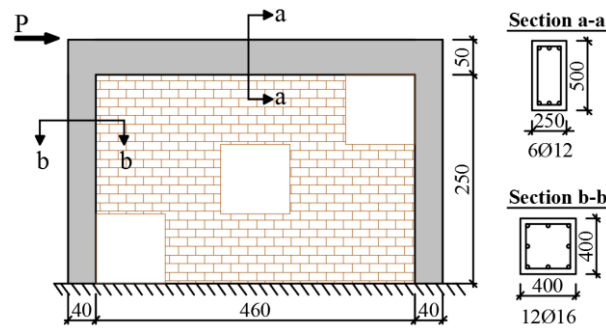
Layout of the openings within the wall and the bounding RC frame.
